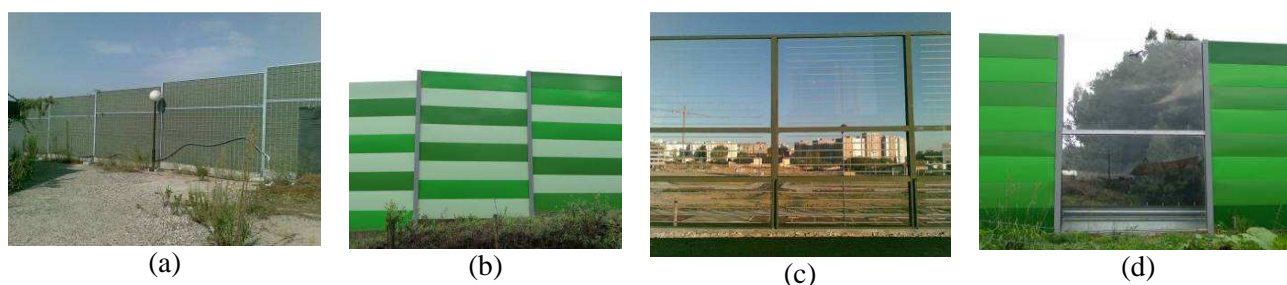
Noise barriers photos: (a) Photo 1 (green barrier); (b) Photo 2 (metal barrier); (c) Photo 3 (acrylic barrier) e (d) Photo 4(mixed barrier)
